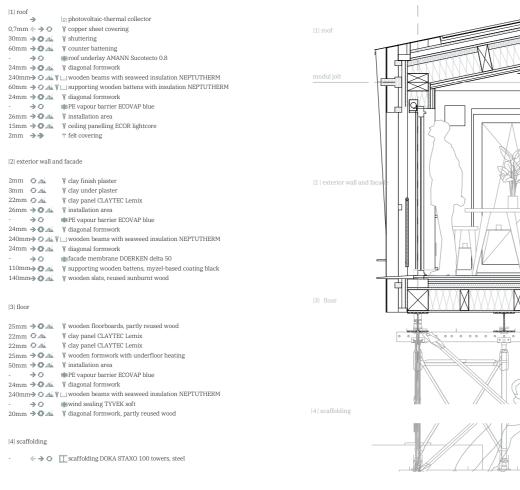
6. RoofKIT material application, Façade section HDU, 2022
